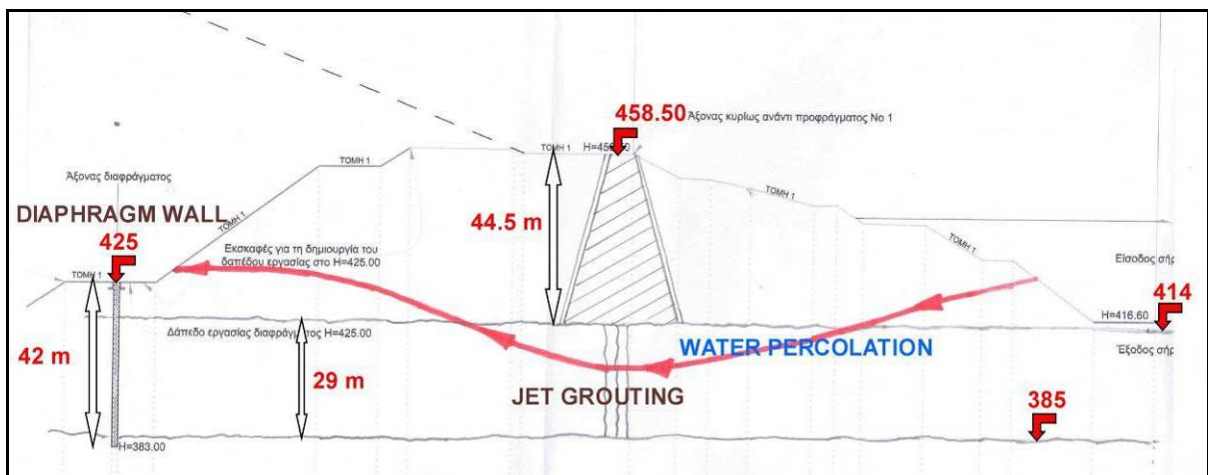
Piping and water flow above the crest of the diaphragm wall
